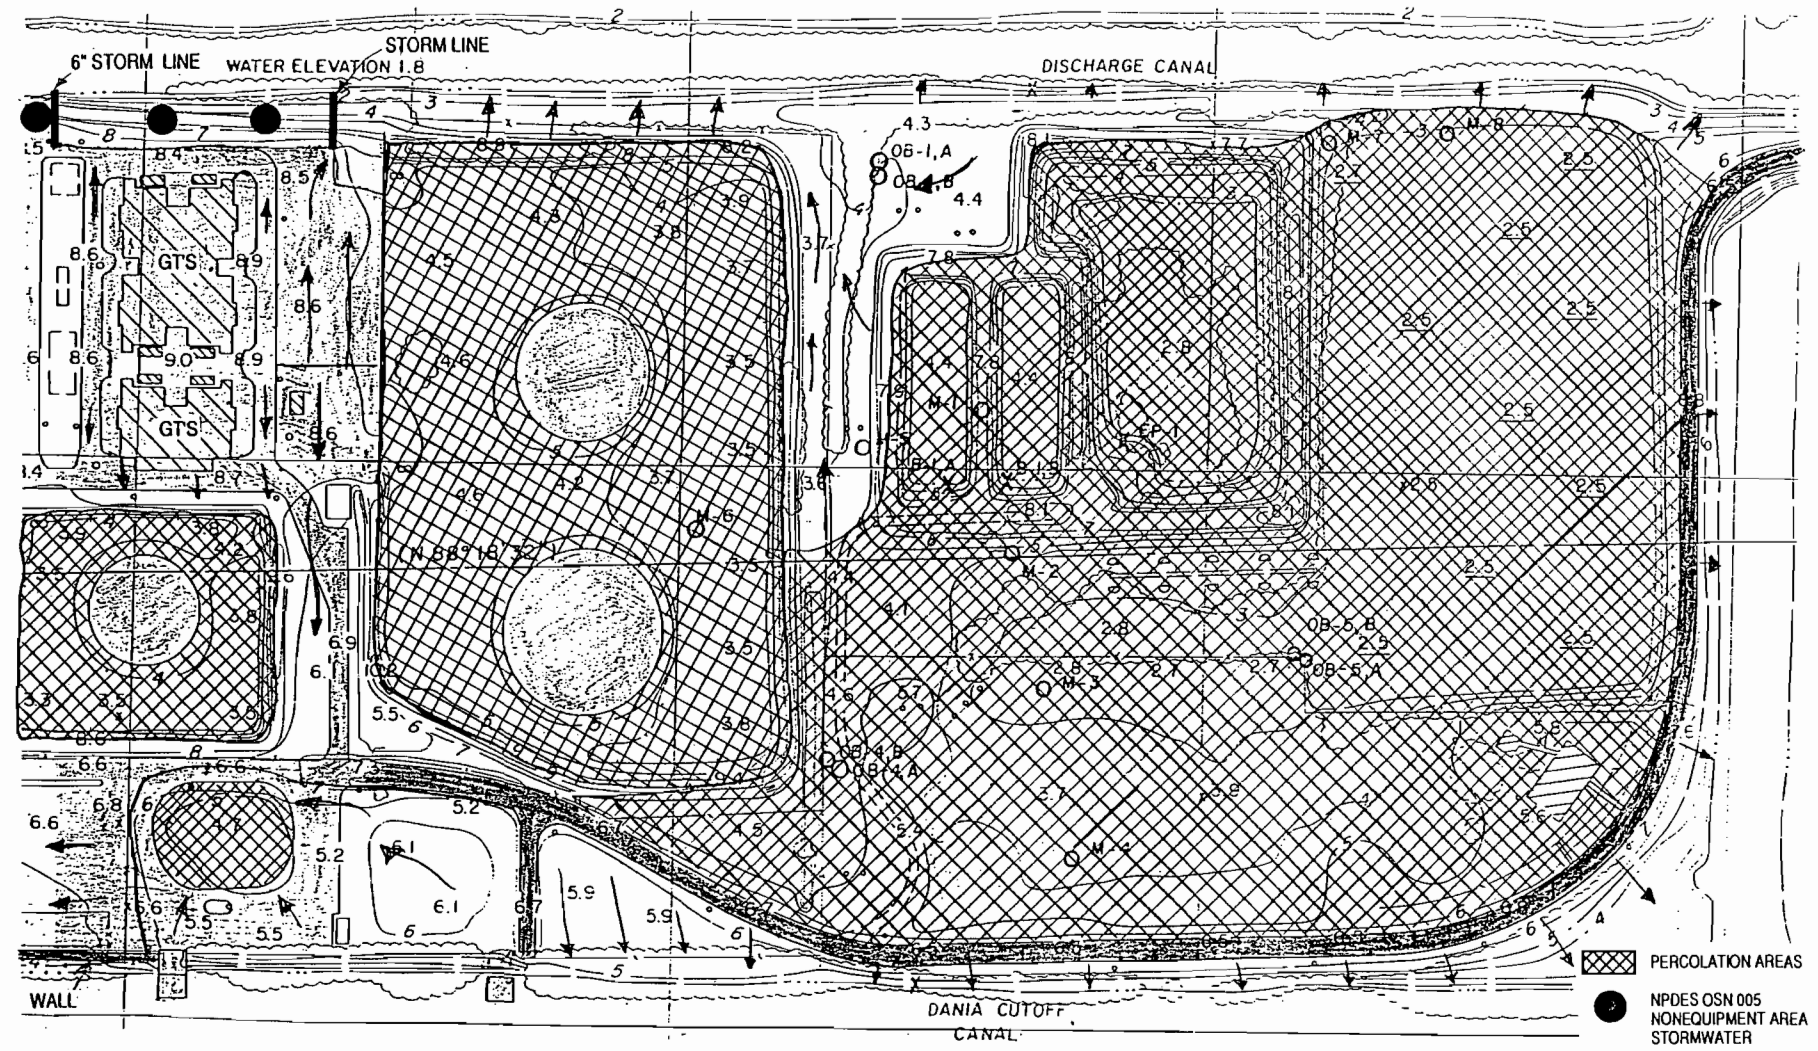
B EASTERN PORTION OF EXISTING PLANT AREA DRAINAGE
